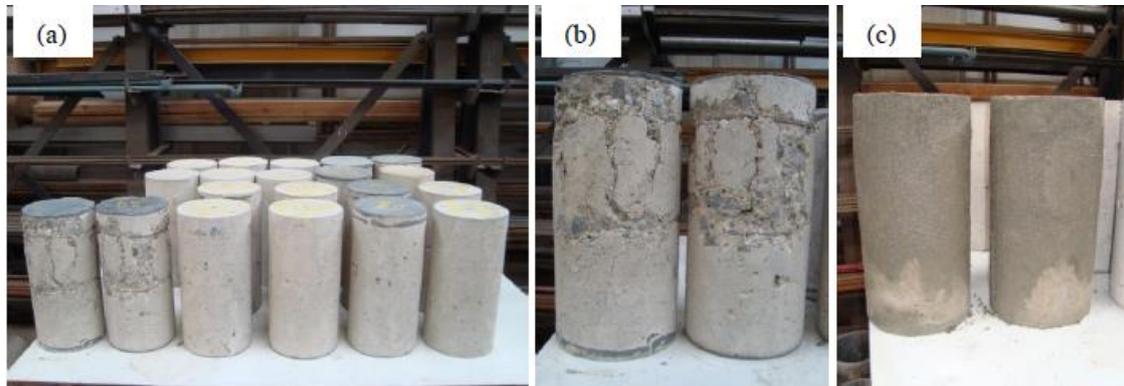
(a) Specimens after initial damage; (b) spalled cylinders; (c) mortar repaired cylinders
